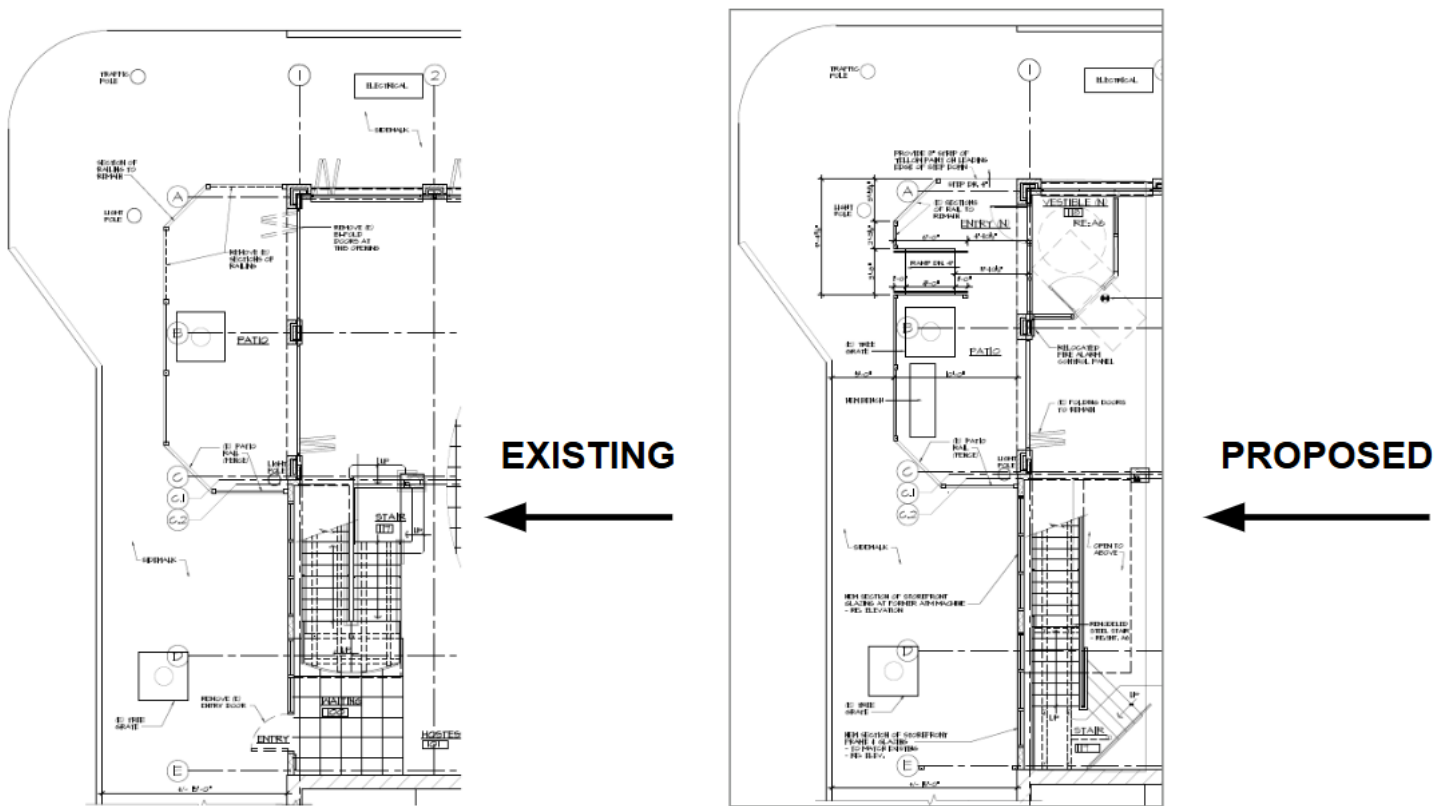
Existing and Proposed plan views showing reconfiguration of entrance and patio for 2589 W. Main St.
